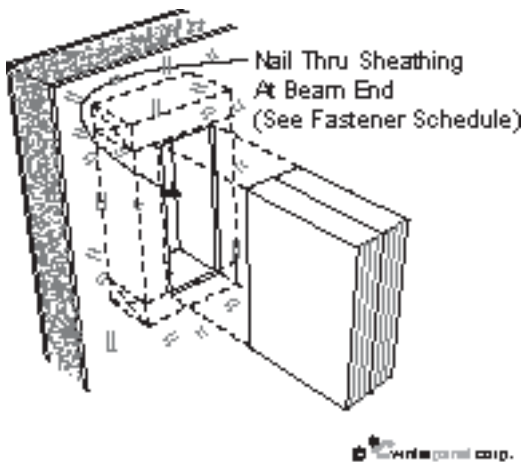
Beam Pocket at Top of Wall—In Field of Panel. Beams or girders to support the second-floor wall are usually set into beam pockets at the top of wall panels. If the pocket does not align with a wall panel seam, the foam is routed out on both sides and below for three two-by “scabs”.
